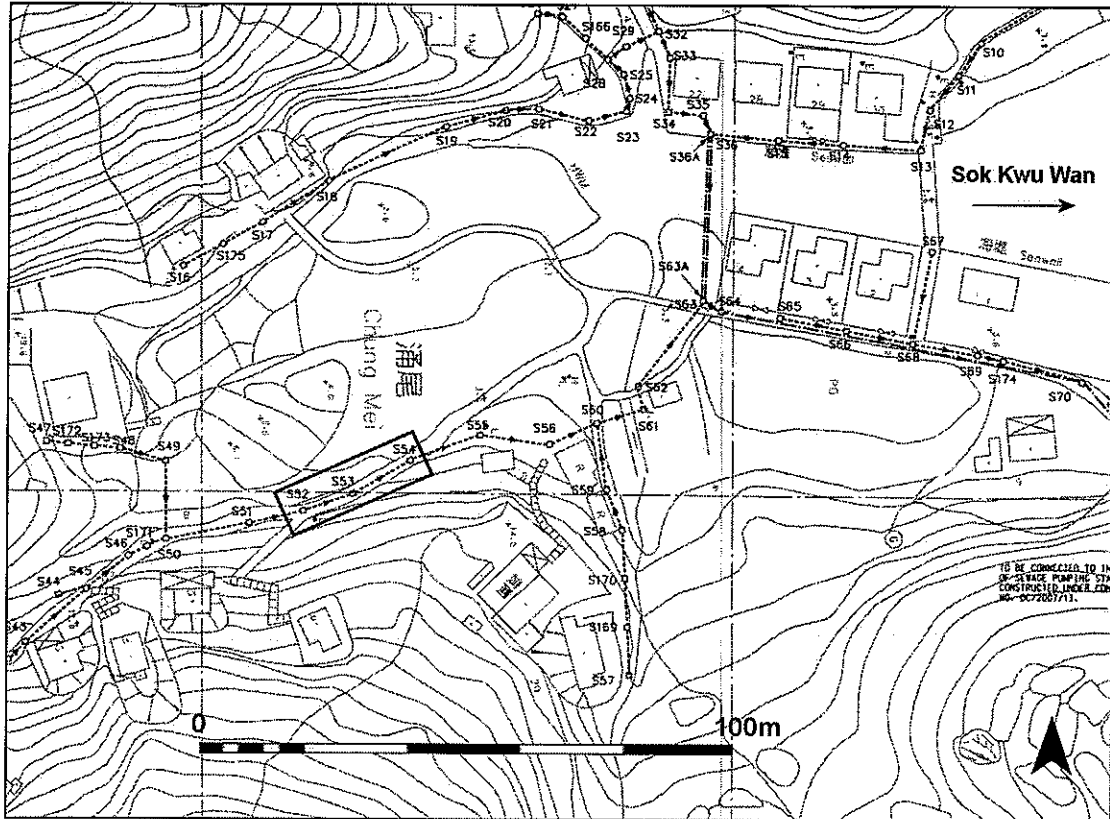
Plan showing location of sewage alignment at Chung Mei, with watching brief section between MH S52 and MH S54 highlighted.
